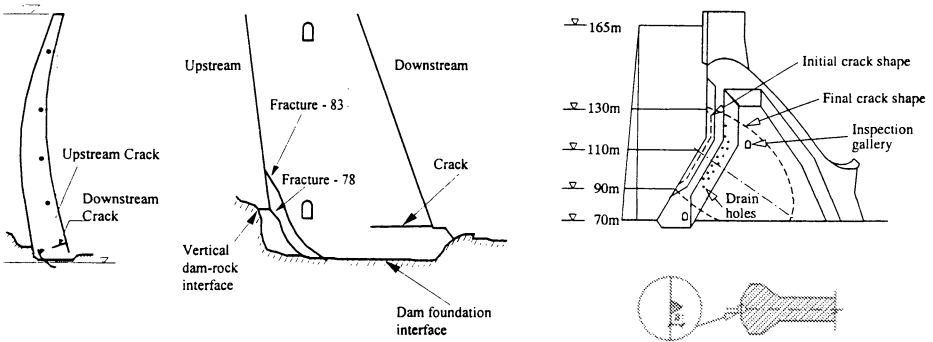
(left) Kölnbrein dam cross-section and details of upstream cracking revealed in 1978 and 1983 and of the toe crack.
